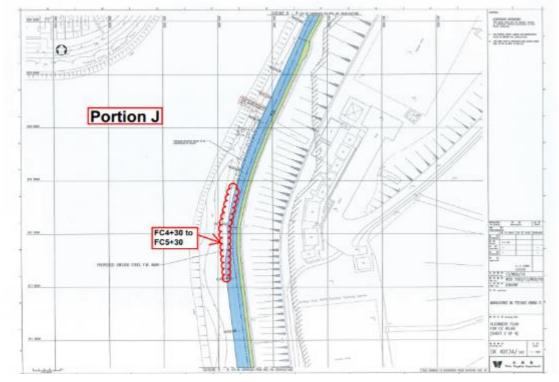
Location Plan – Landfill Stage 1 (Area FC4+30 -FC5+30)
